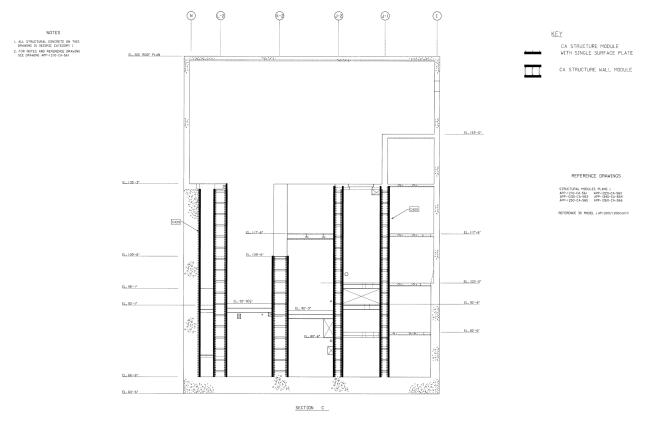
(Sheet 5 of 5) [Structural Modules in Auxiliary Building]\
